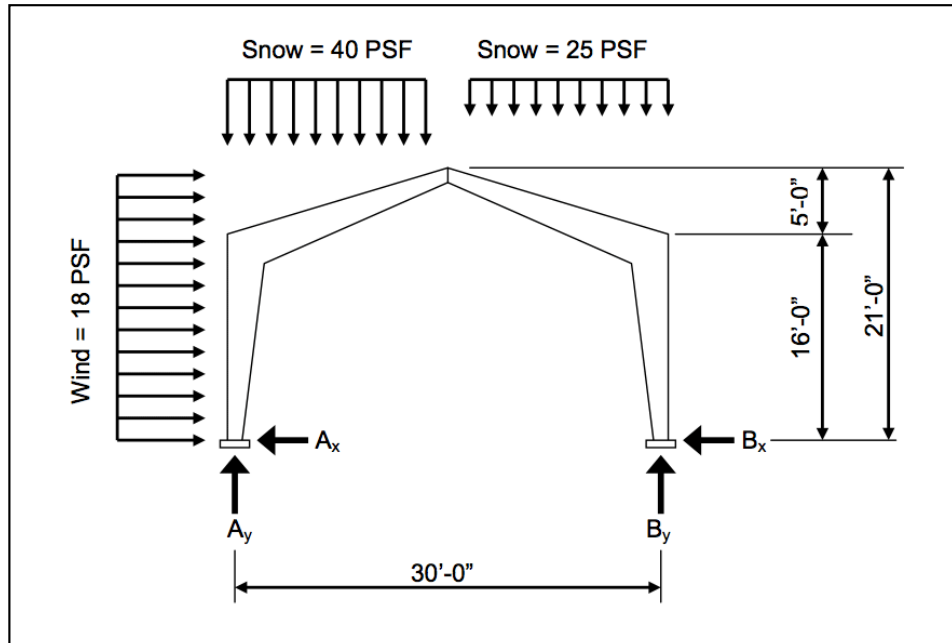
Elevation view of pre-fabricated steel building frame subject to snow and wind loadings.
